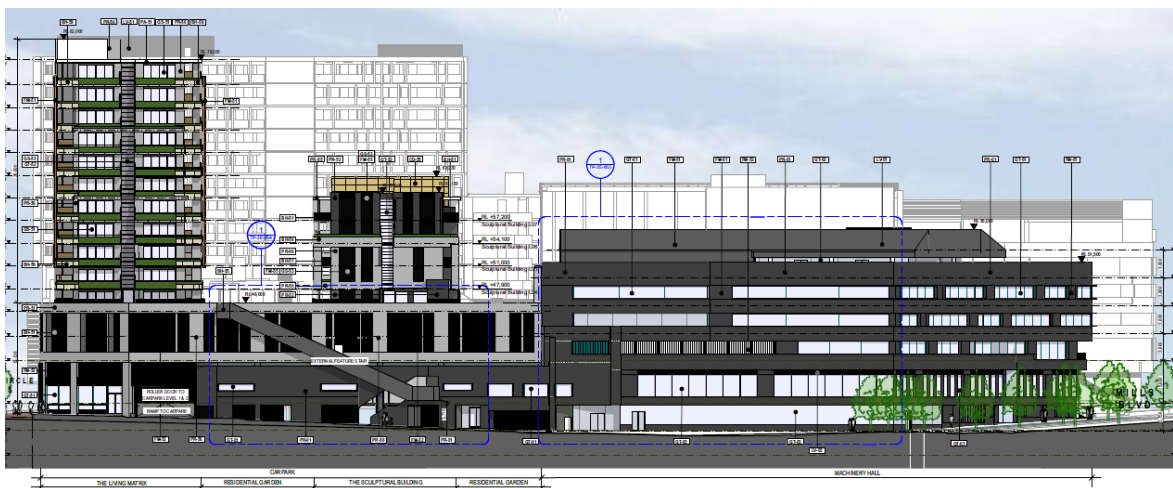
Previous amendment Nelmoore Lane (southern) elevation
